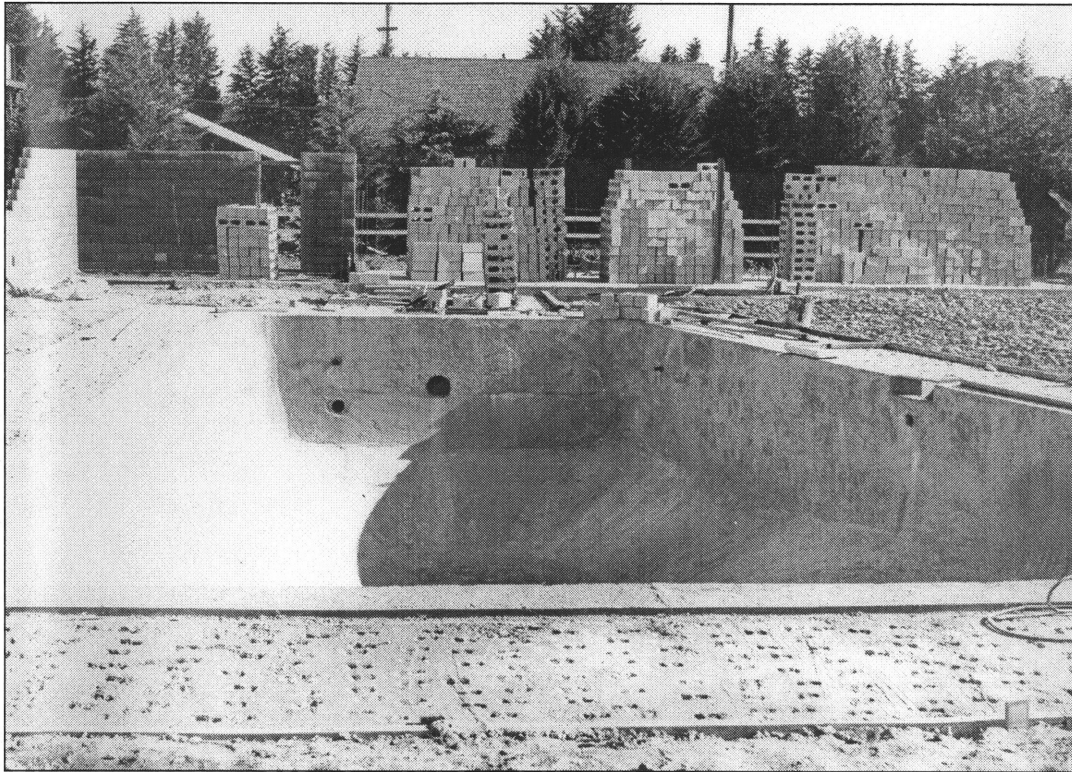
Concrete has been poured for pool, concrete masonry units (CMU) in background to be used for outbuilding construction, looking north.
